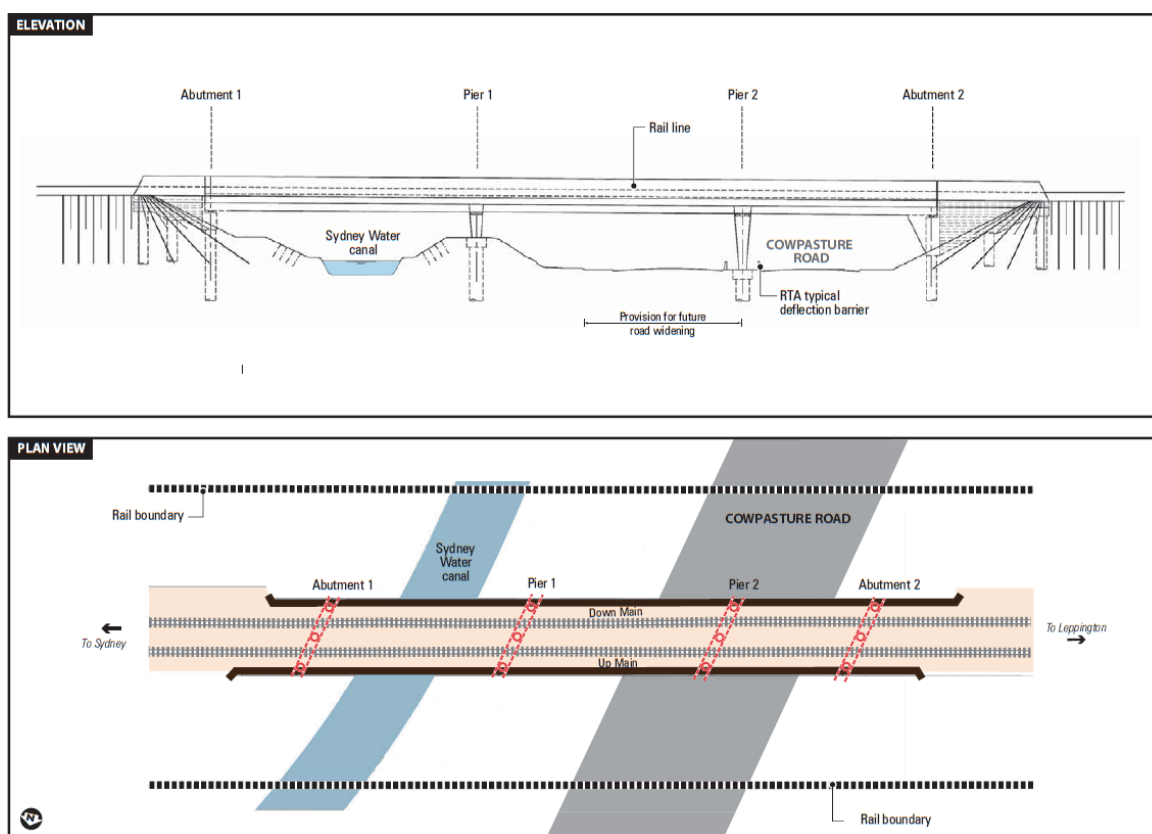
Elevation and plan of the Upper Canal and Cowpasture Road underbridge. Existing cutting slope reinforced with rock bolts prior to bridge construction.
